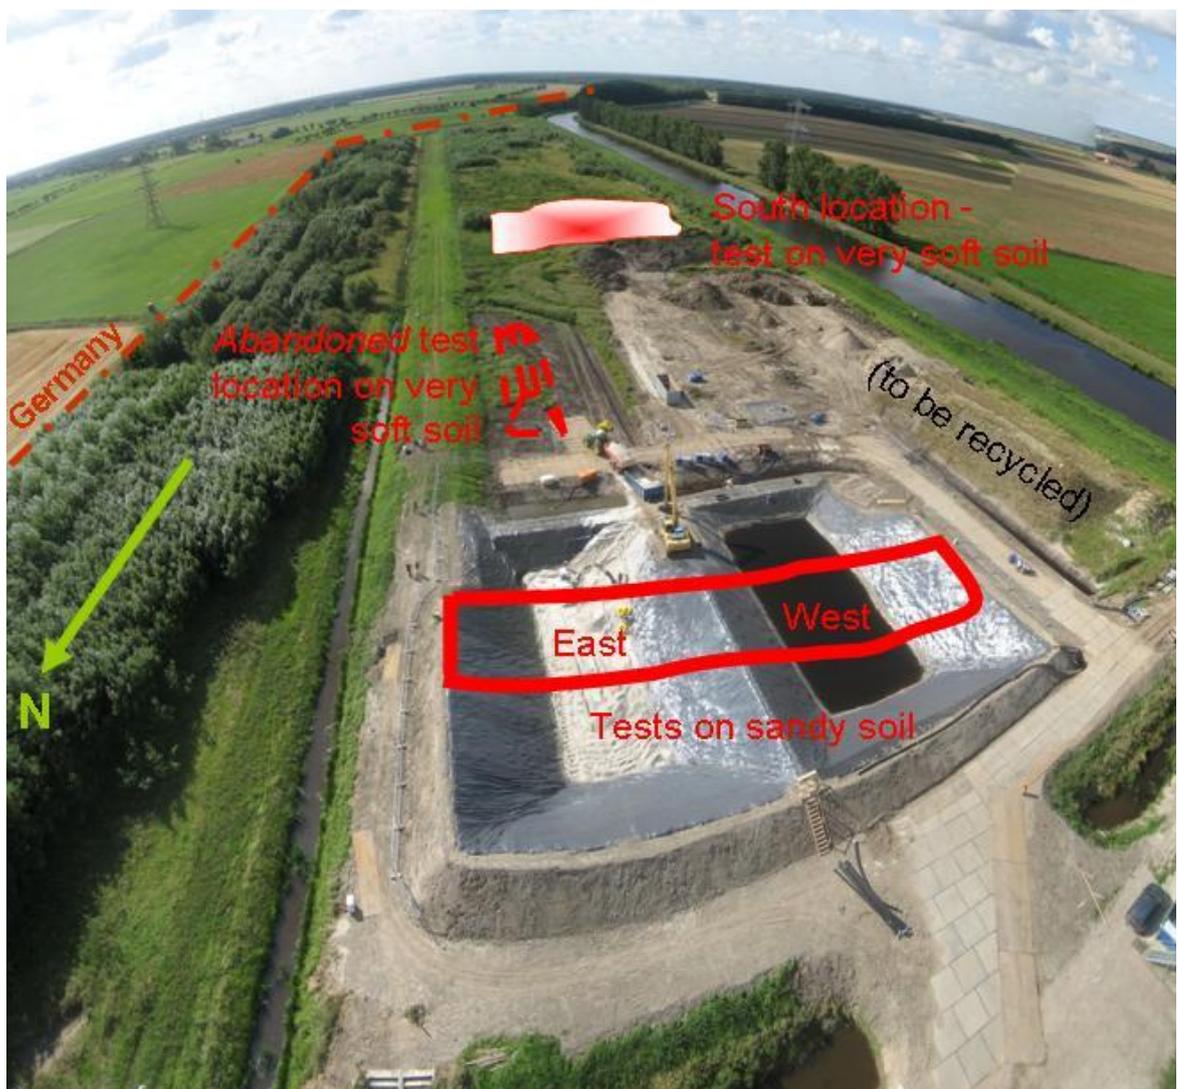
Bird's eye view of the test site with the proposed locations of the various test levees
